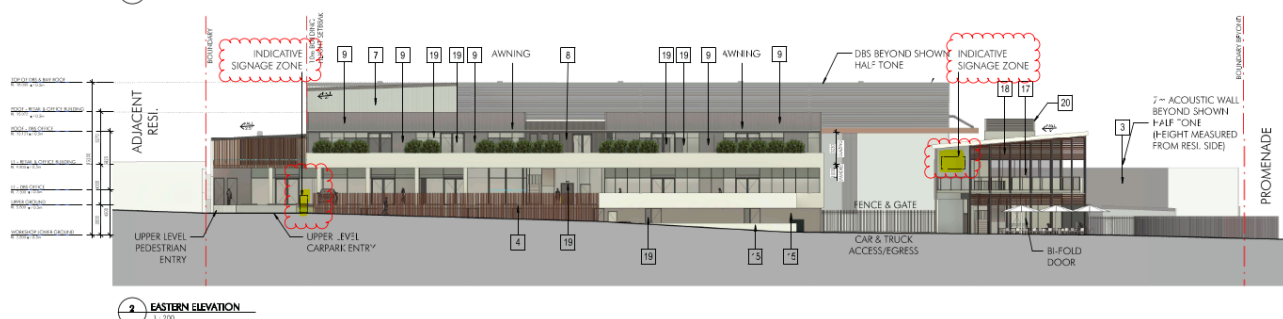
eastern elevation with signage envelope and pylon sign highlighted
